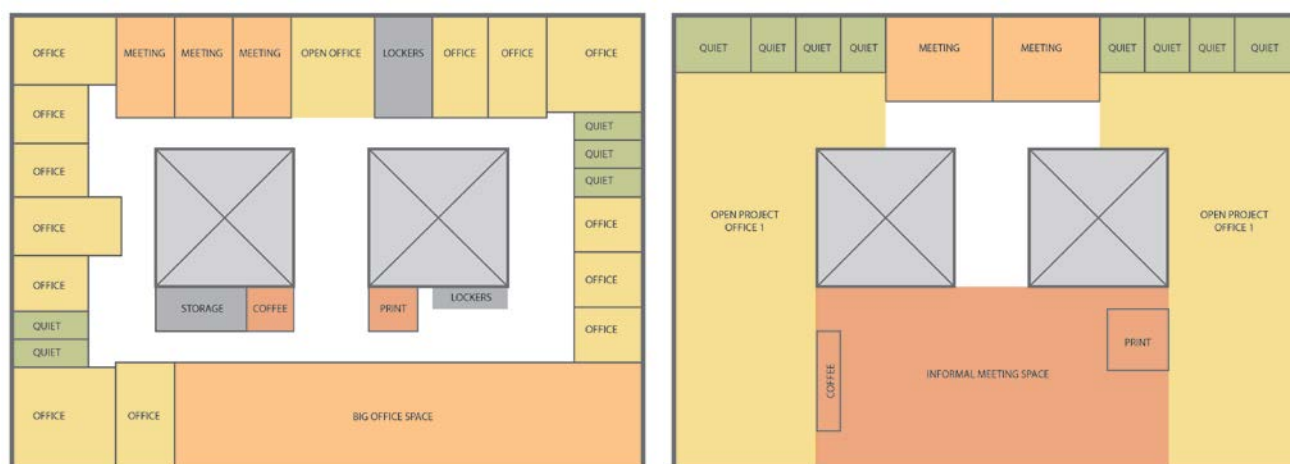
the current plan (left) and a new proposal (right). Diagrams made by the author.
